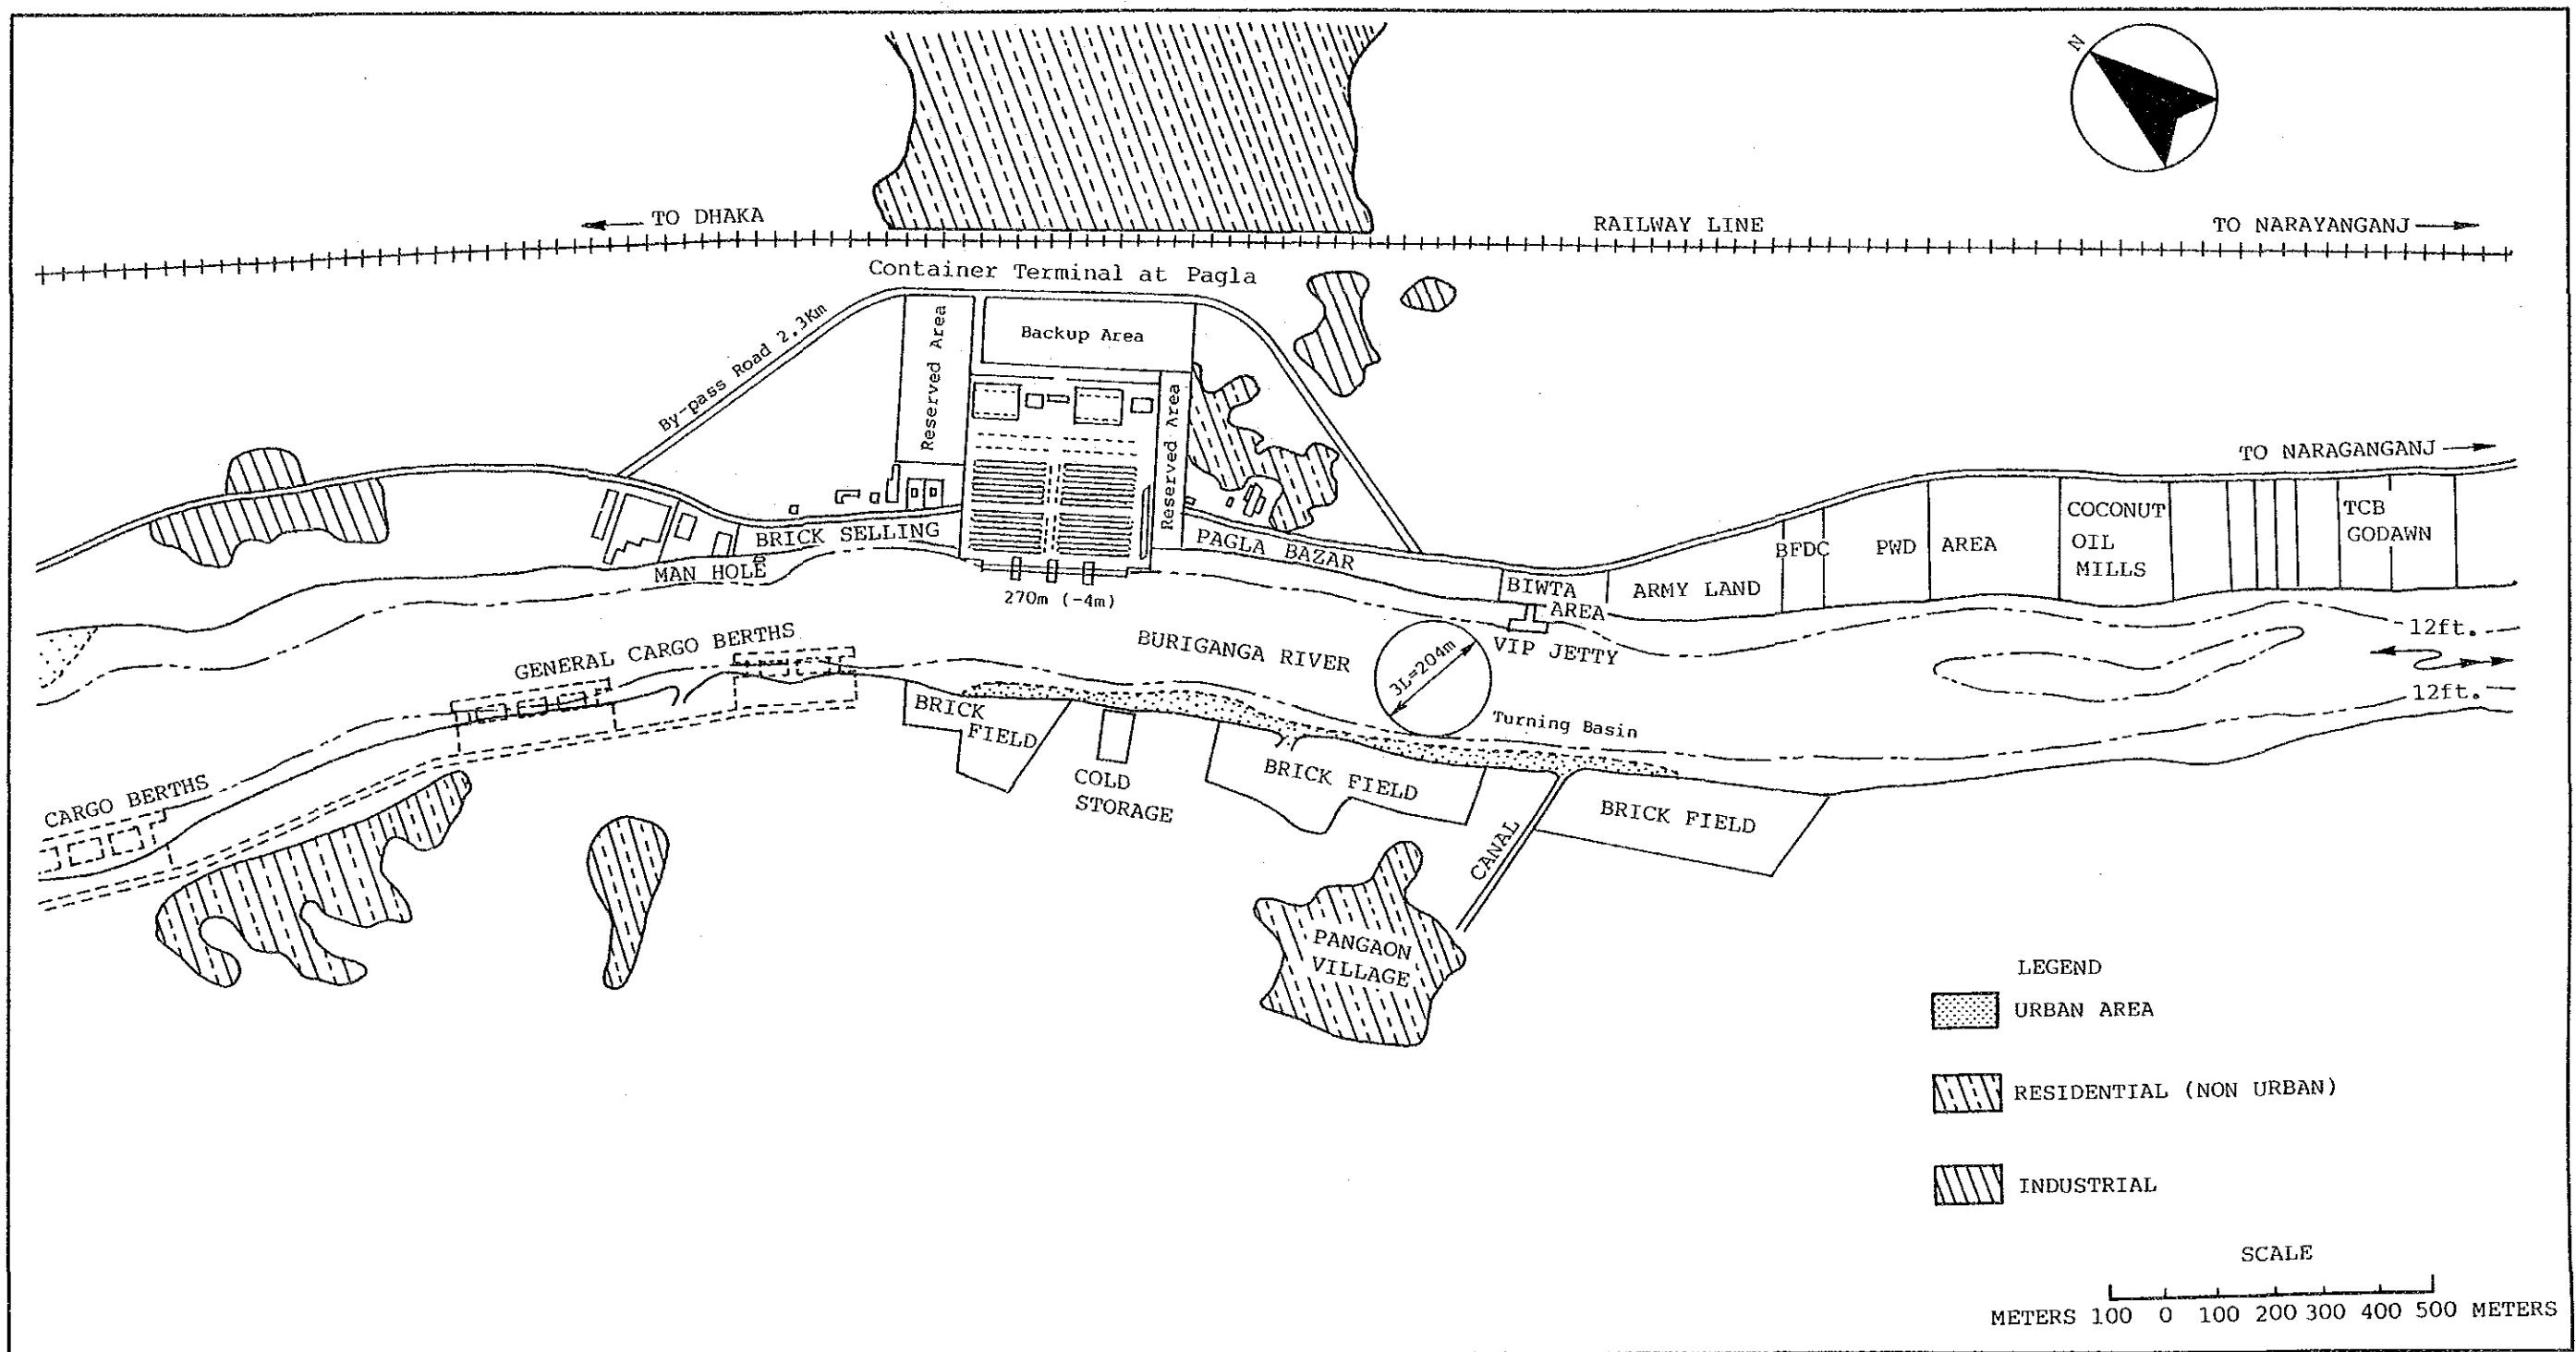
Alternative Development plan at Pagla Site - Case 2
